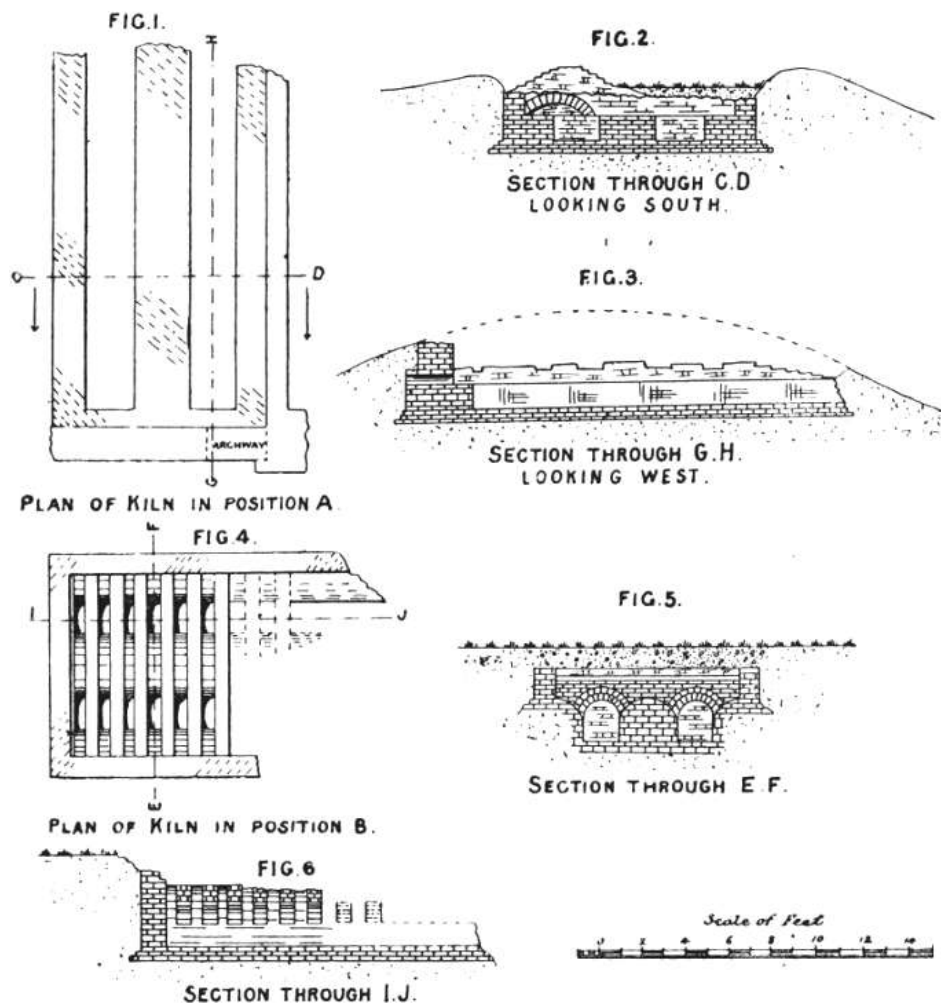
Plans and sections of the brick-built kilns excavated in Potters Field in 1894 (Martin, 1902, p. 131)
